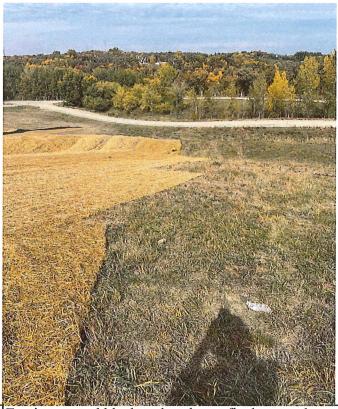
Erosion control blanket placed over final cover along north half of tie-in to existing liner; looking north.
